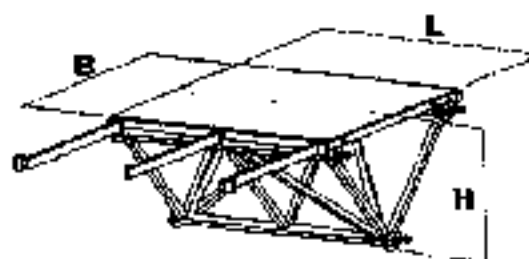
Platform element 1.5 m (4.92 ft)
